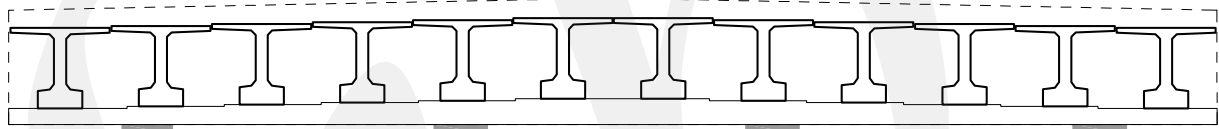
Bridge superstructure with 2% transverse slopes.
